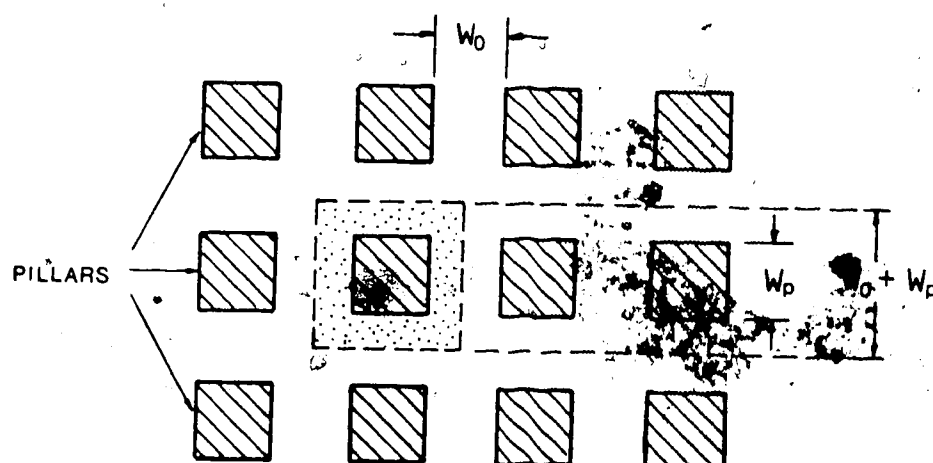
SQUARE PILLAR LAYOUT PLAN
